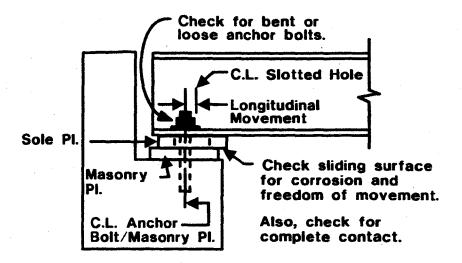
Sliding Plate Bearing Inspection Checklist Items
